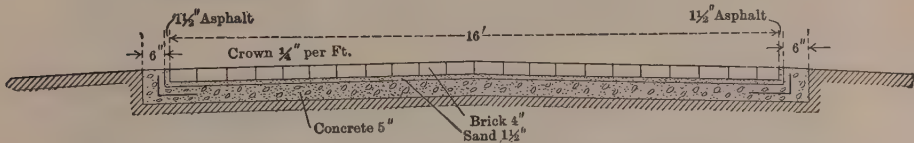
Standard Section of Brick Pavement, New York State Department of Highways.
